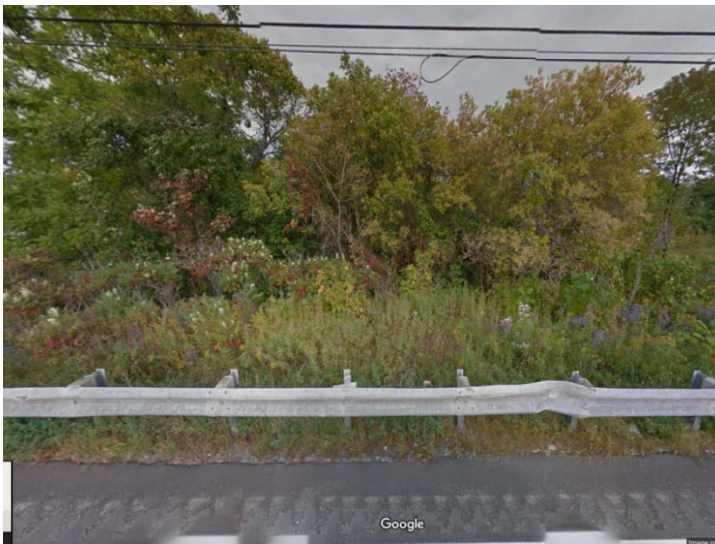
CR#1 - East side of Bayview Drive (Google Street View).
